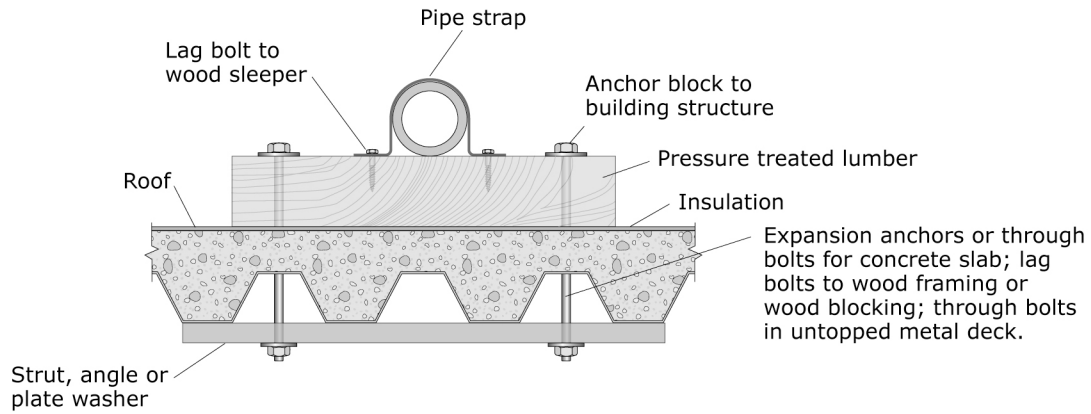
Roof-mounted pipe stand and sleeper anchored to slab (ER).
